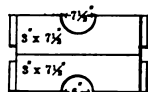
Plan View of Timbers Used Between the Two Upright Rollers.
